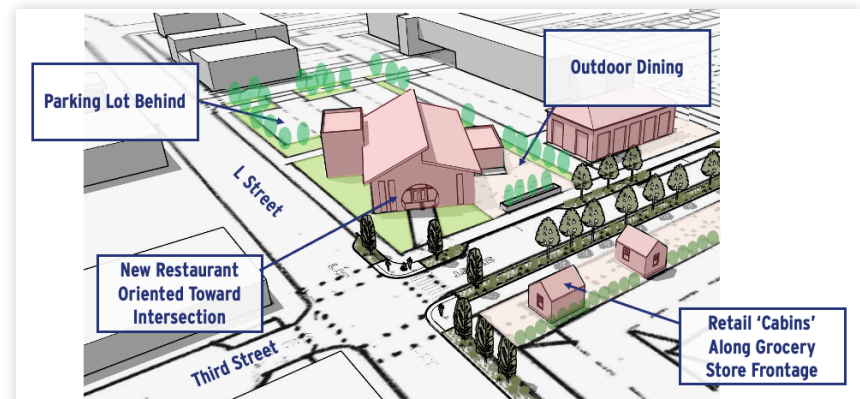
Anchor Development Site- Third Street and L Street Option 1
